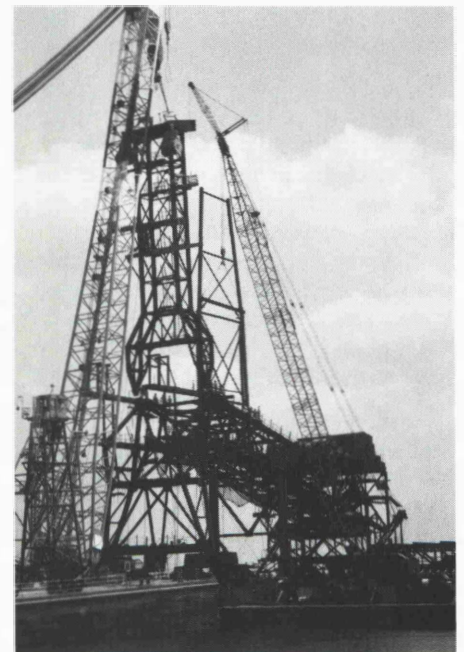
Mast assembly suspended from Sun 800 barge mounted crane
